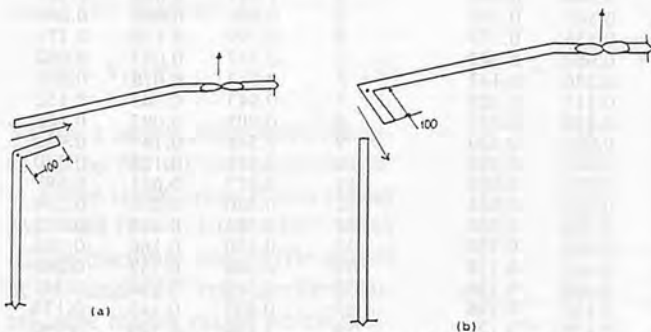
Slotted hinged inlet arrangements for exhaust fan ventilation system: (a) ceiling flow and (b) wall flow.
